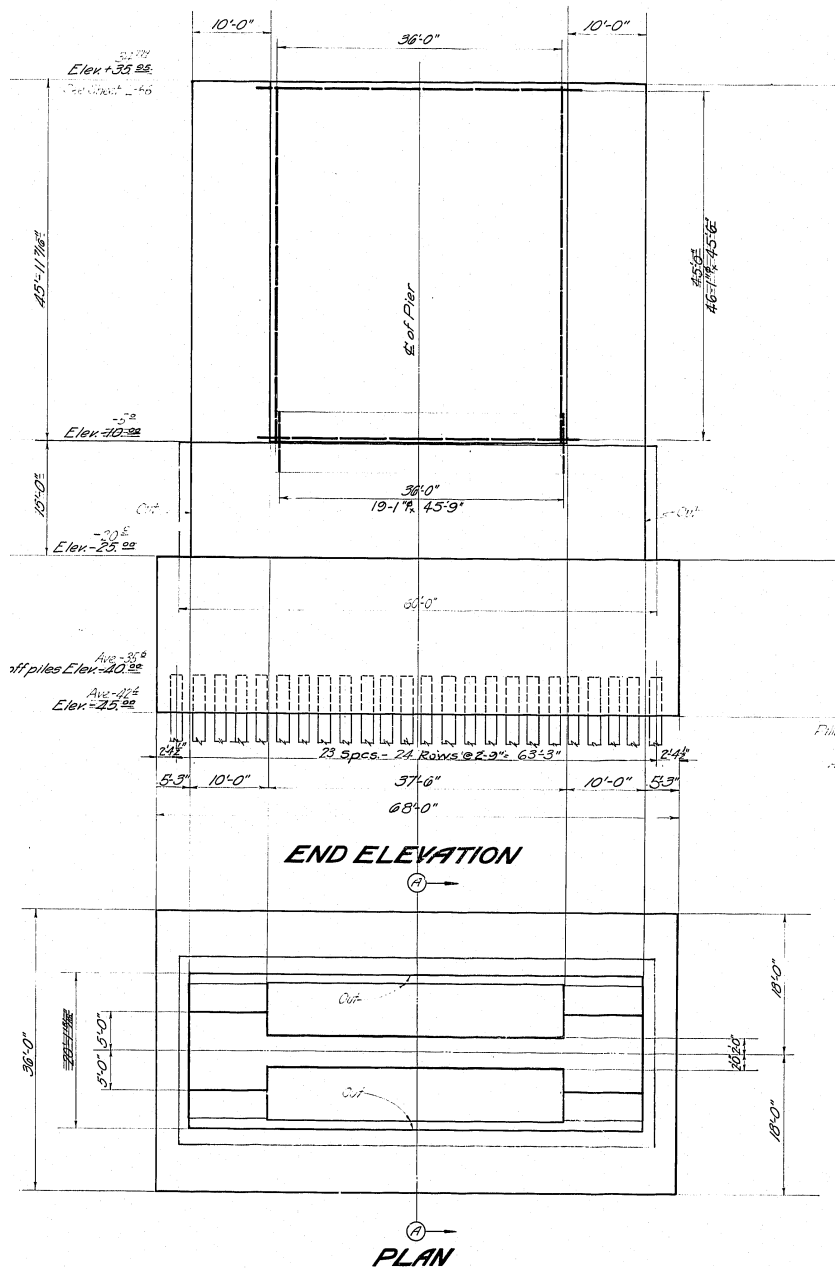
Burnside Bridge Fixed Spans Piers 1 & 4 Columns, lightly reinforced and without proper seismic reinforcing detailing
